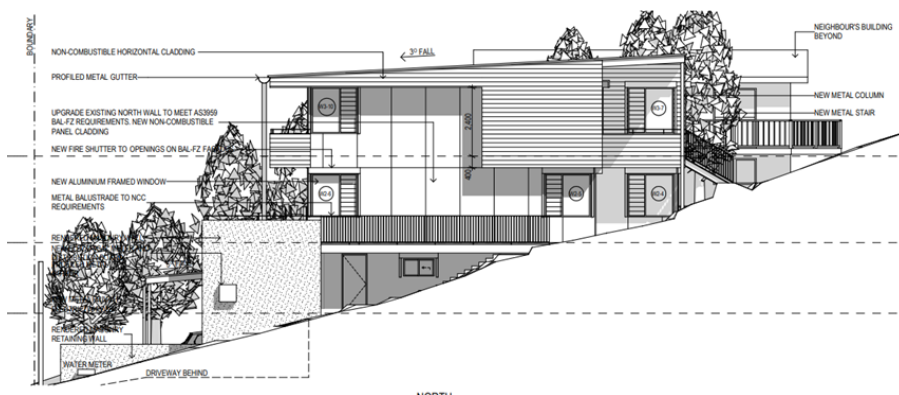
North elevation. (Source: Bourne and Blue Architecture)
